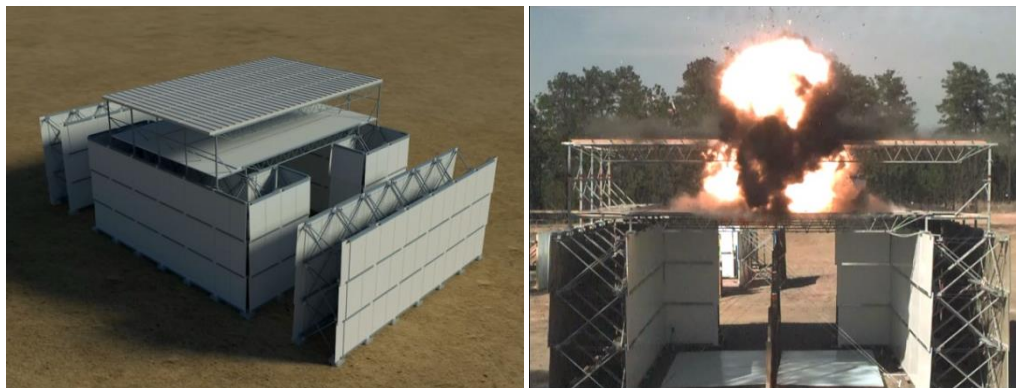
Rendering of a typical MPS system (left) and small mortar test of MPS system (right)
